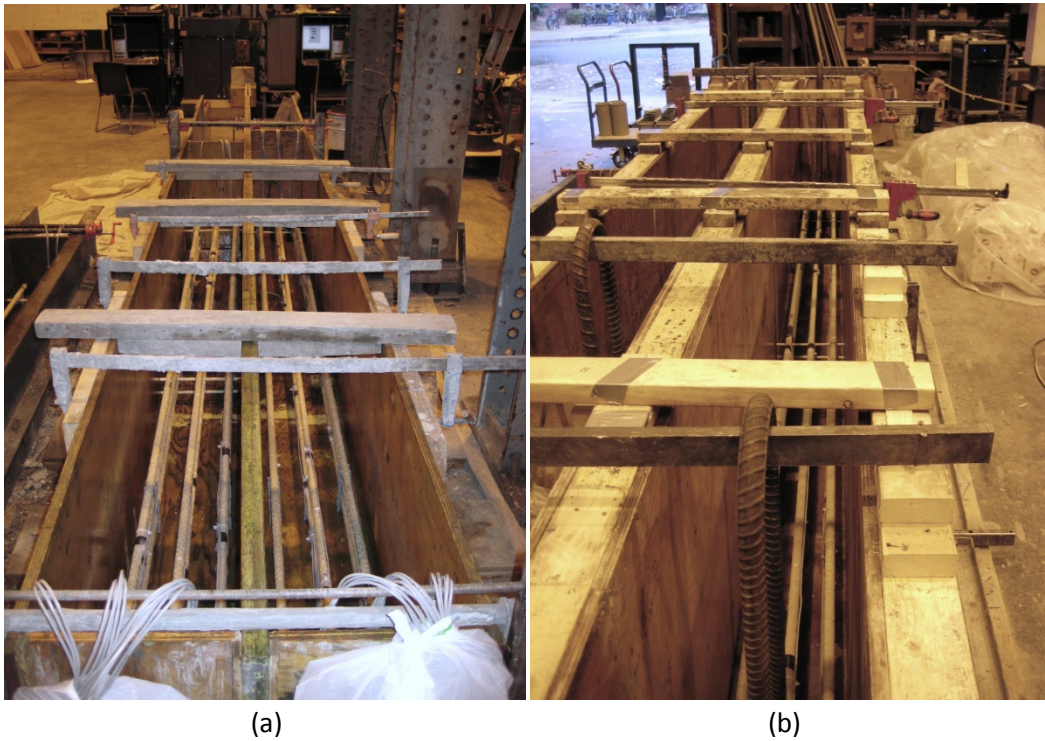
(a) 600 mm deep (specimen B5H left and B6H right) and (b) 1000 mm deep (specimen C1N left and C2N right) formwork ready for the concrete.
